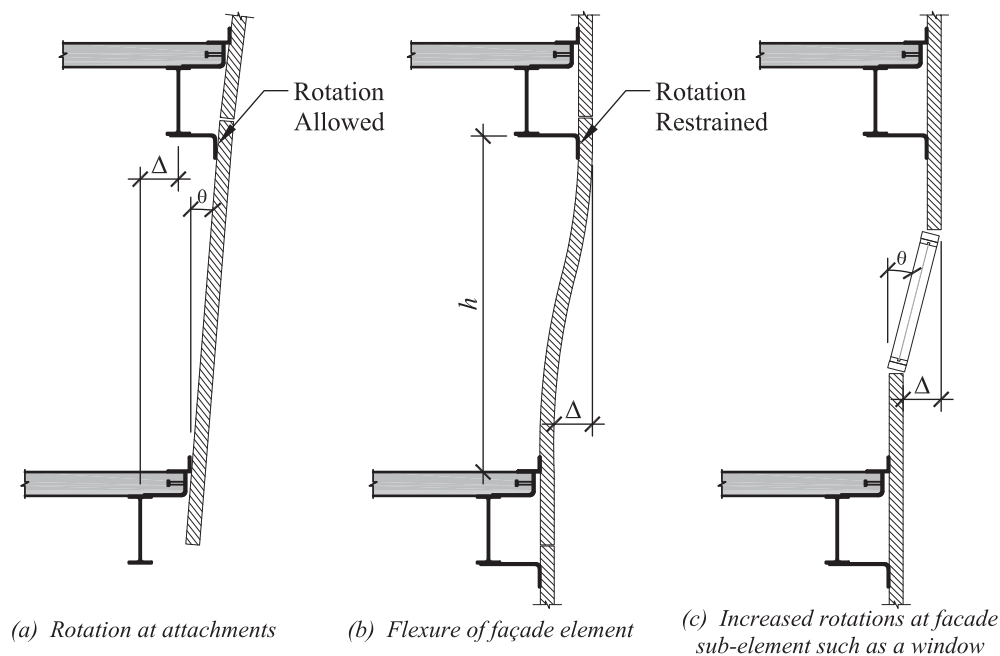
Effects of out-of-plane inter-story drift on façade panels.
